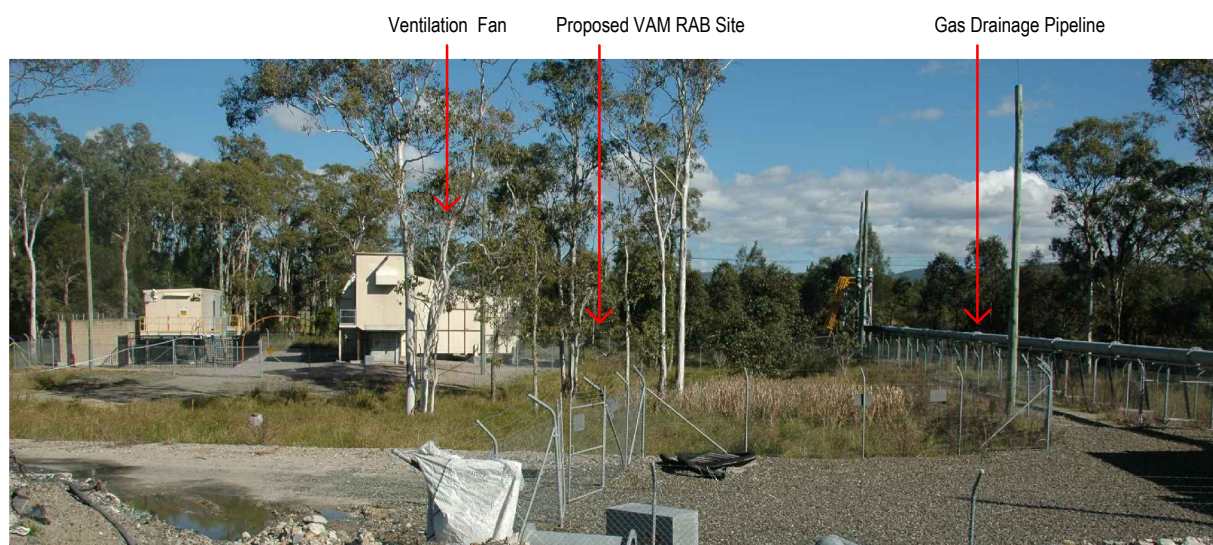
View looking west towards Ventilation Fan and proposed site of VAM RAB
